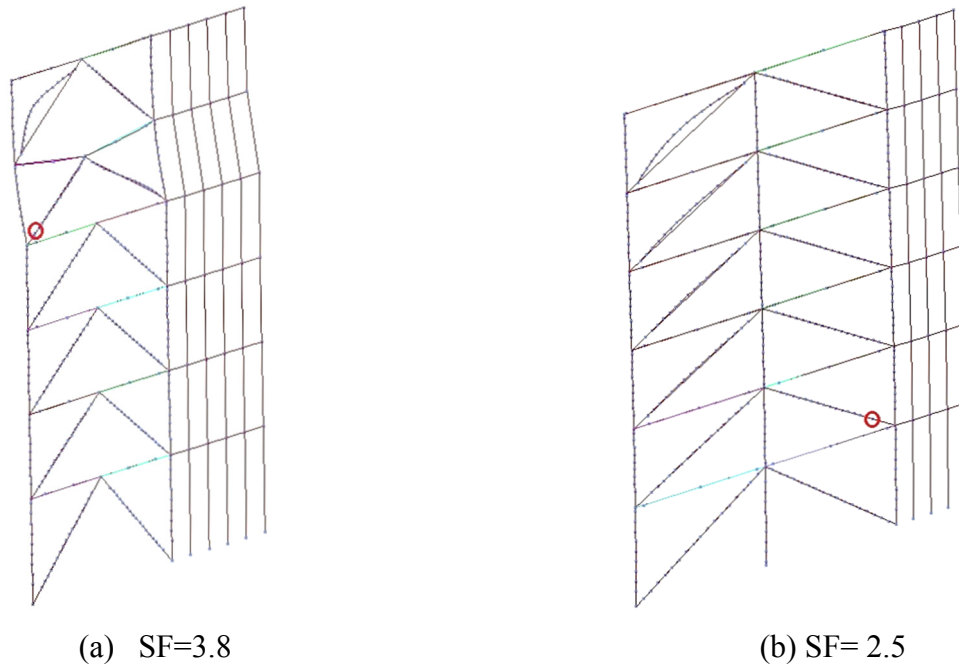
First brace-to-frame connection failure under S8.EN1 ground motion for the 6Q building: (a) E-W direction; (b) N-S direction
